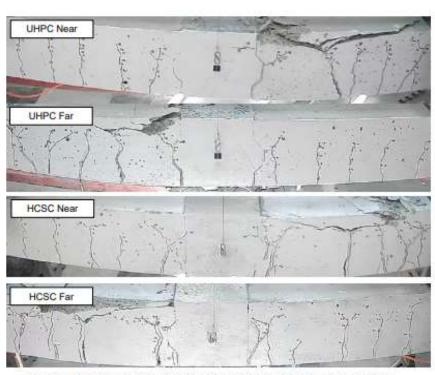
Elevation View of Cracking of D/D Panel Assemblages at Ultimate Flexural Capacity
